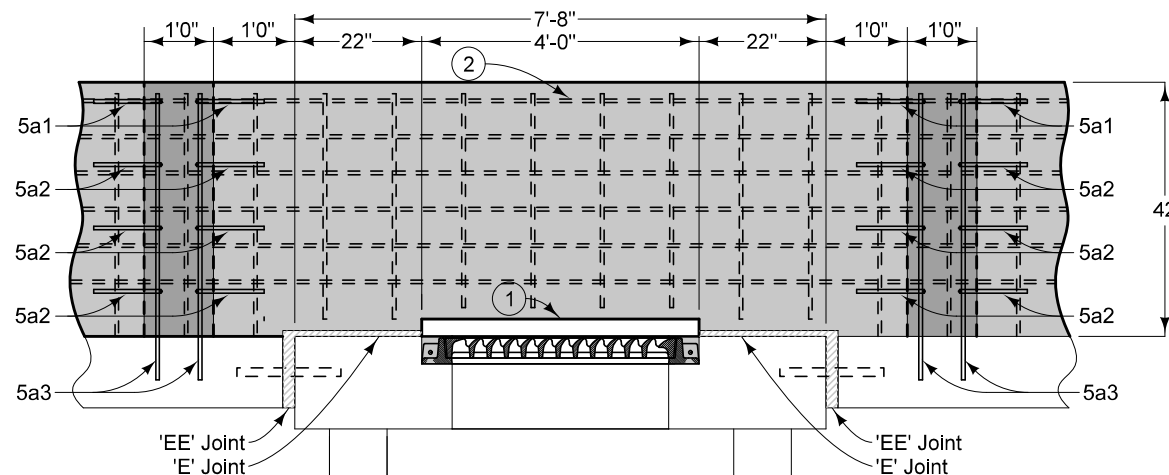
DETAIL OF BARRIER RAIL DRAIN SLOT AT INTAKE LOCATION
